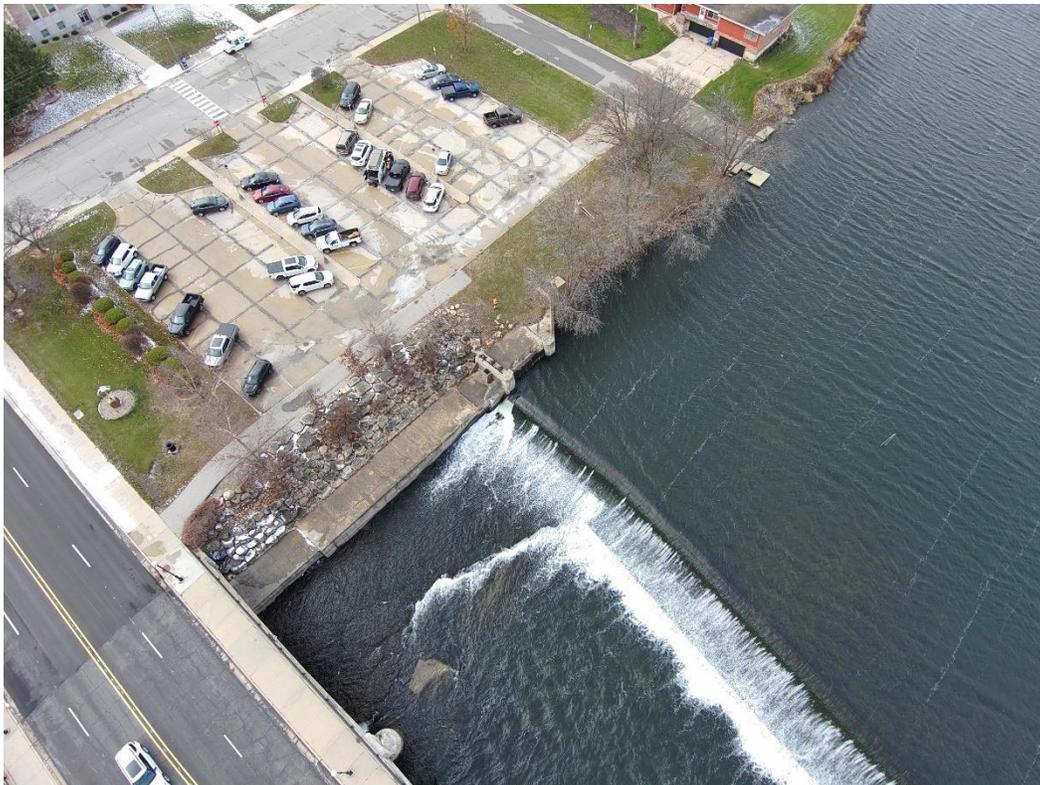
SOUTHWEST SHORELINE LOOKING SOUTHWEST
